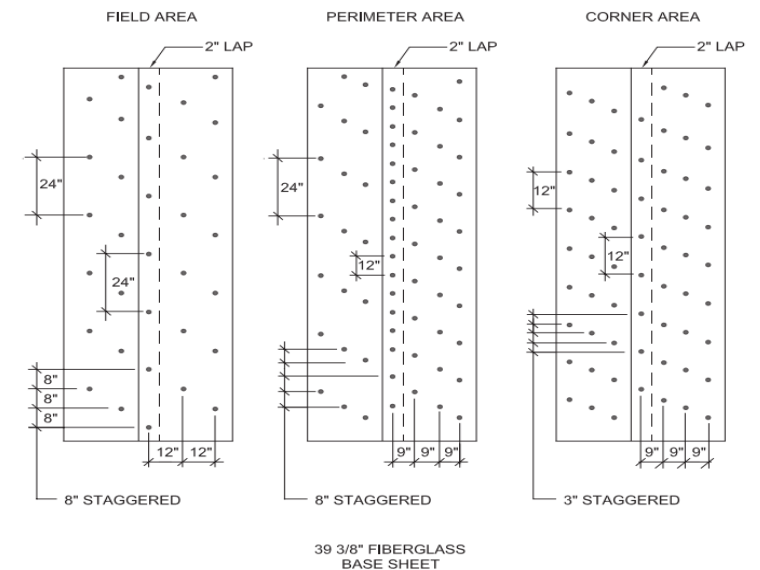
Typical NRCA detail for a mechanically fastened roof membrane system. This type of system is NOT recommended for gypsum decks.
